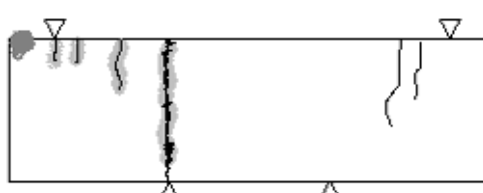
Typical failure modes and crack patterns for flexurally reinforced MBrace™ carbon beams.
